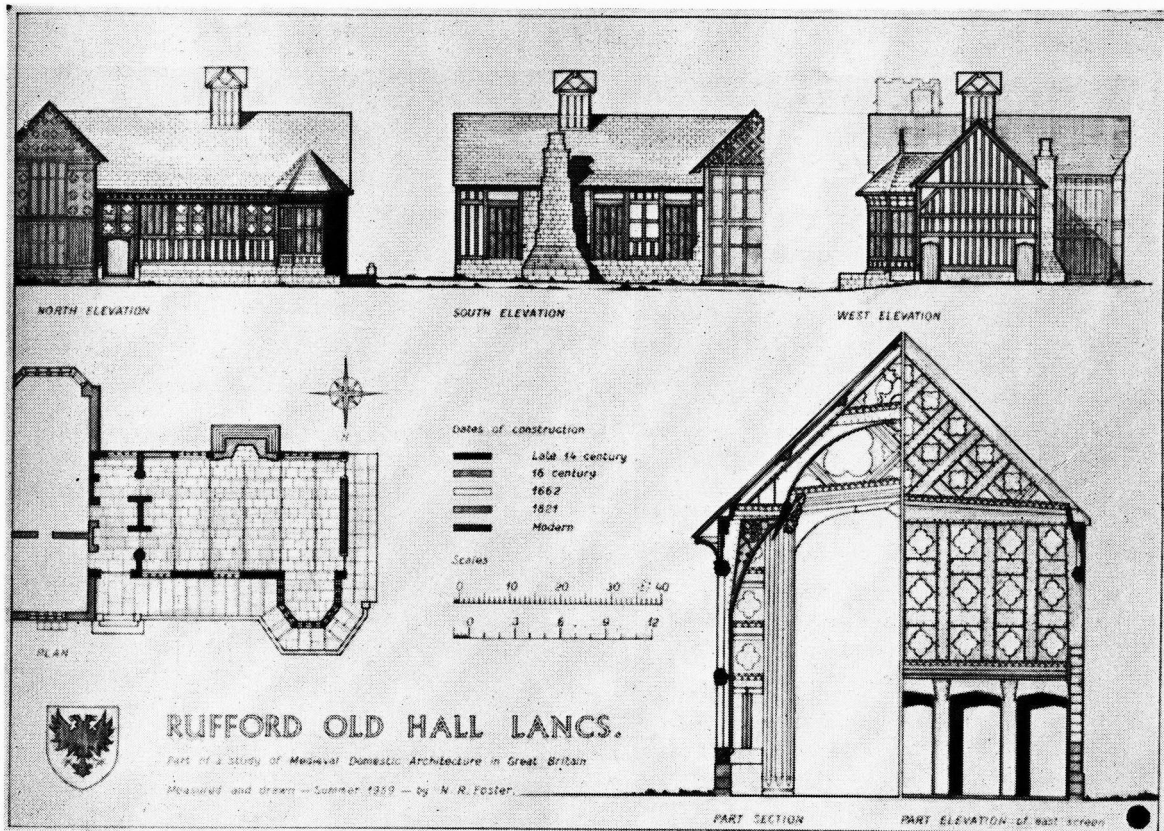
RUFFORD OLD HALL, LANCASHIRE.
